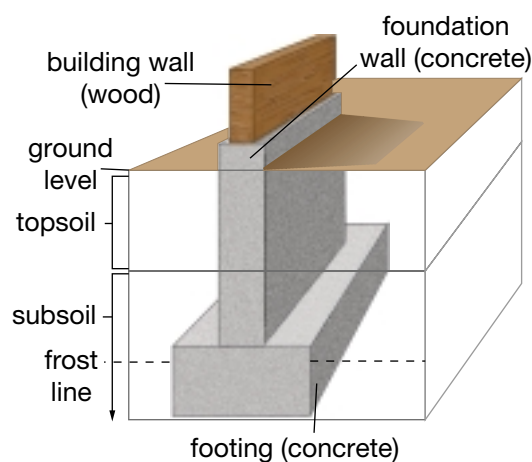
C Footings beneath a foundation wall reduce stress on the soil.
